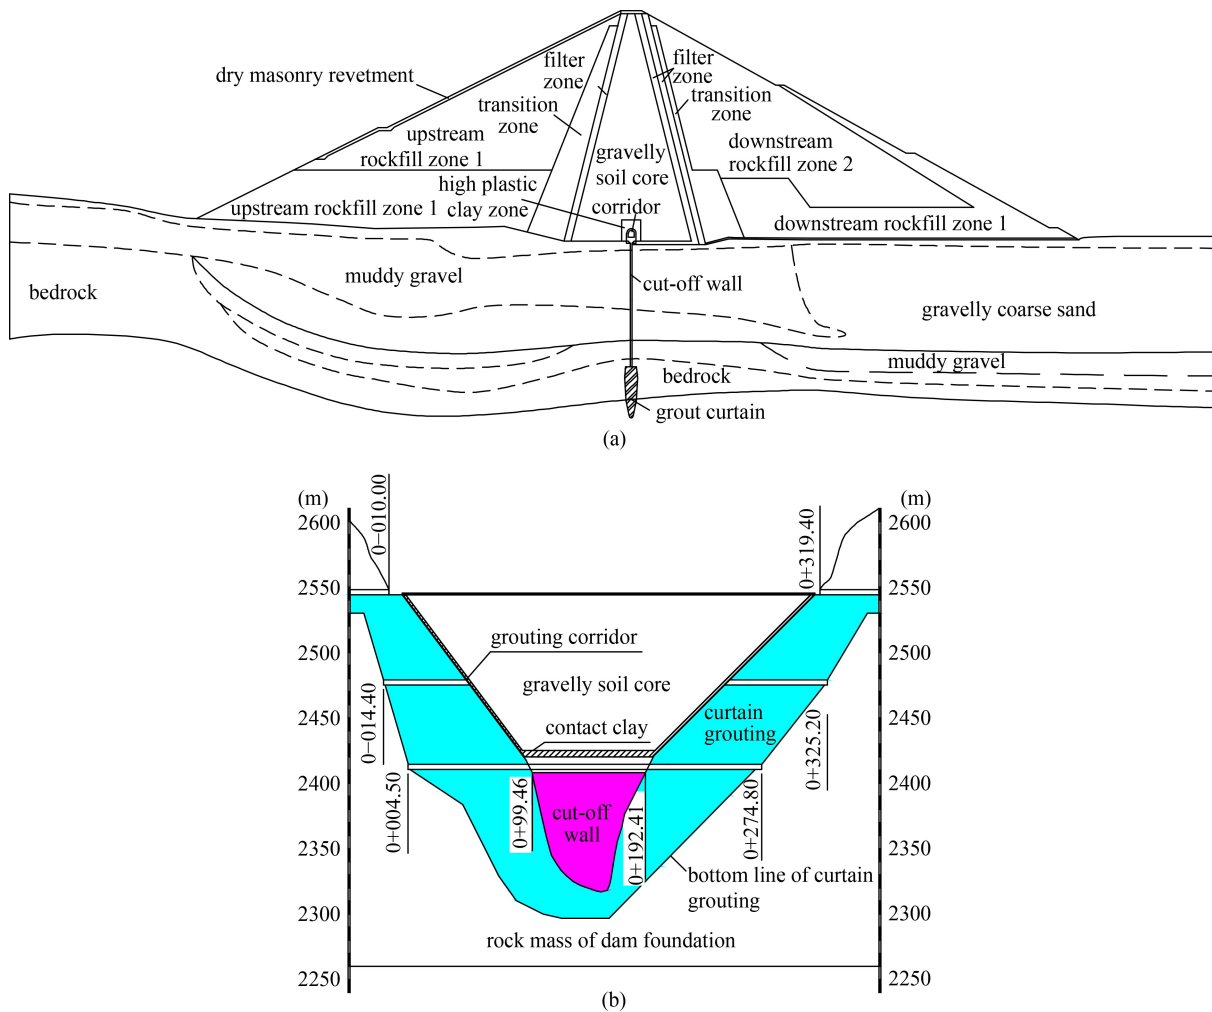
Typical cross-section of the core rock-fill dam. (a) 0+150 m cross-section; (b) cross-section at the dam axis.
